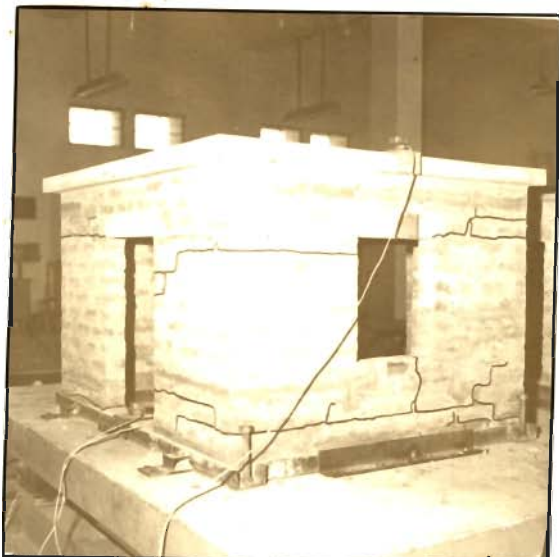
NORTH AND WEST WALLS OF MODEL NO. 1 DAMAGED WITH FIXED BASE
